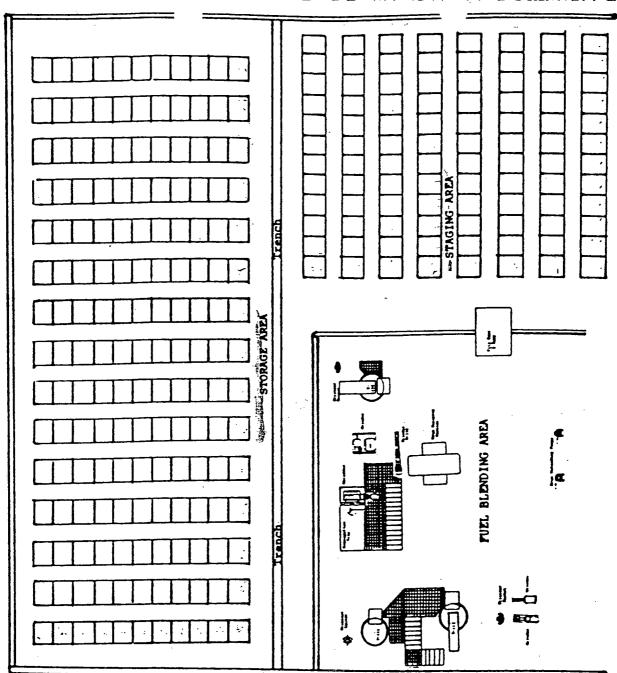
Arrangement of Drums within the Drum Storage Building ;
